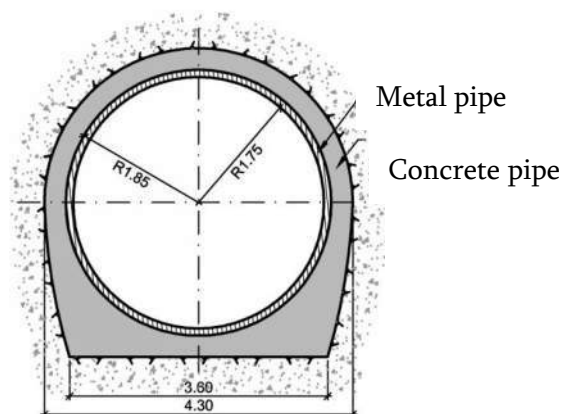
Cross section of tailrace tunnelFigure 4.4.2. Cross section of pressure tunnel
